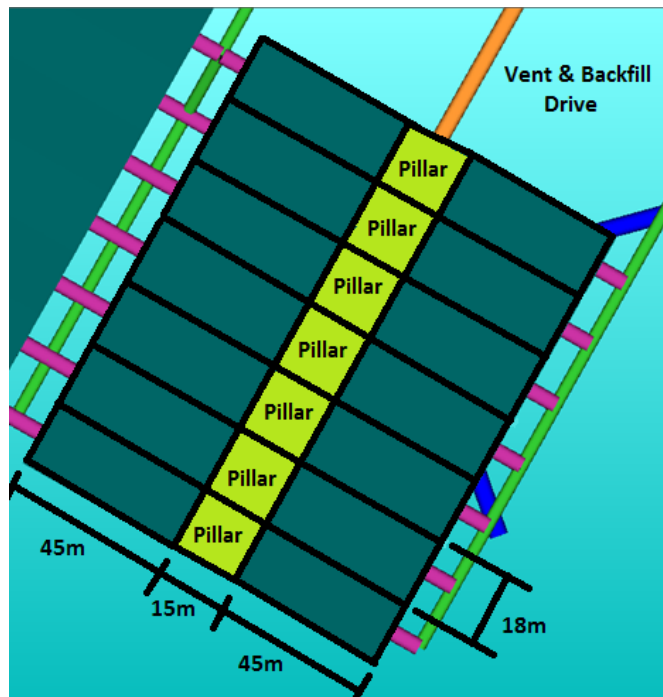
CGDI Stope Design Dimensions with Pillar Location
